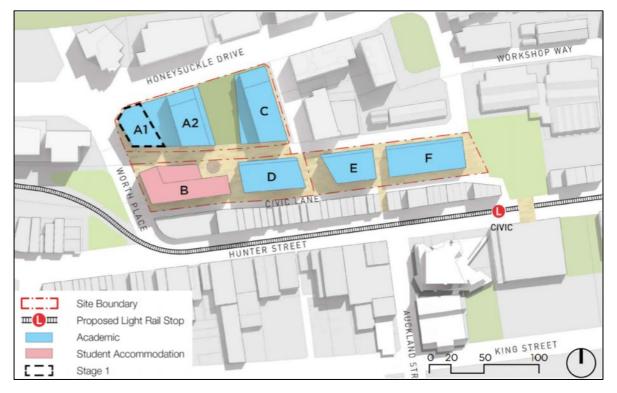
UON HCCD—CONCEPT PLAN PROPOSED BUILDINGS (SOURCE: COX ARCHITECTURE 2017)
